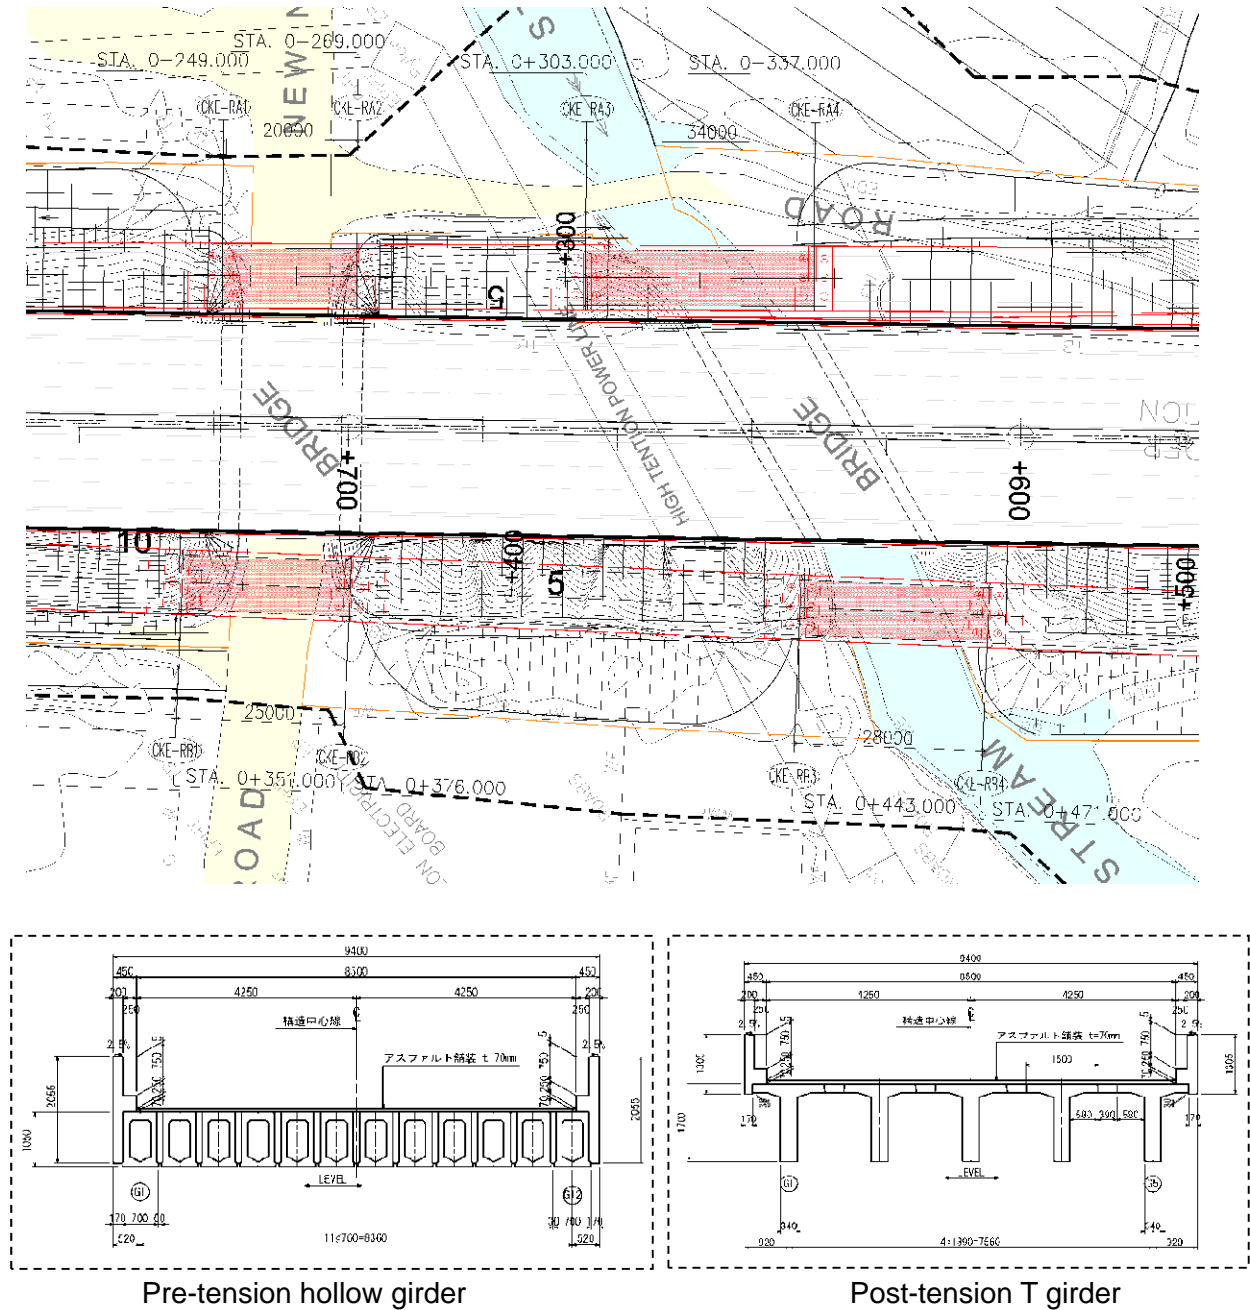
Deck Span, Girder Configuration (Separated Section)
